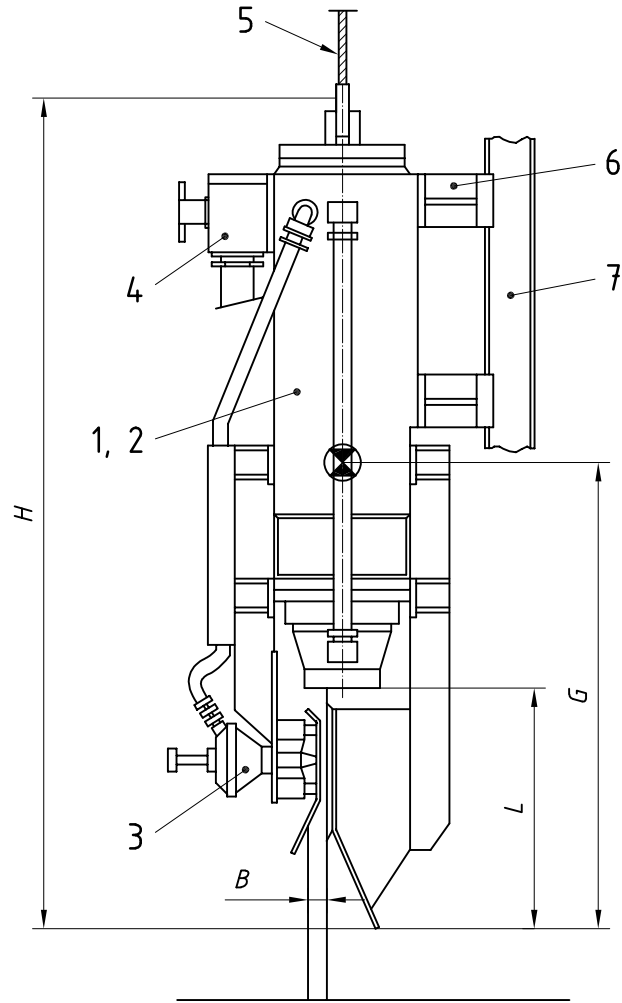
Piling equipment on a floating carrier with diesel-powered impact hammer
